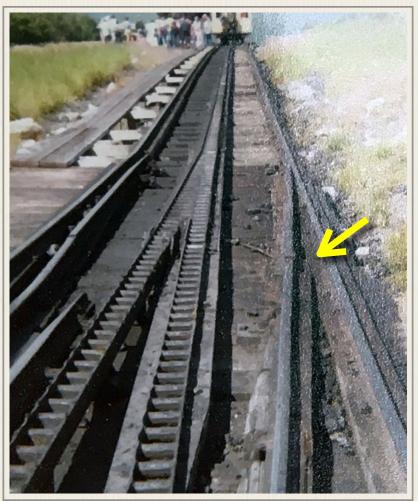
Down-mountain view of Waumbek Switch set for movement from siding (1979) - King photo / NH Transportation Dept.
